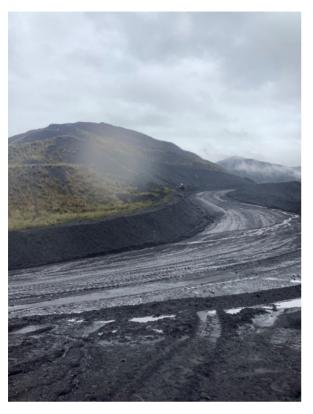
Site B CCR Facility - Overview of West Side; Looking South, 17 August 2021
